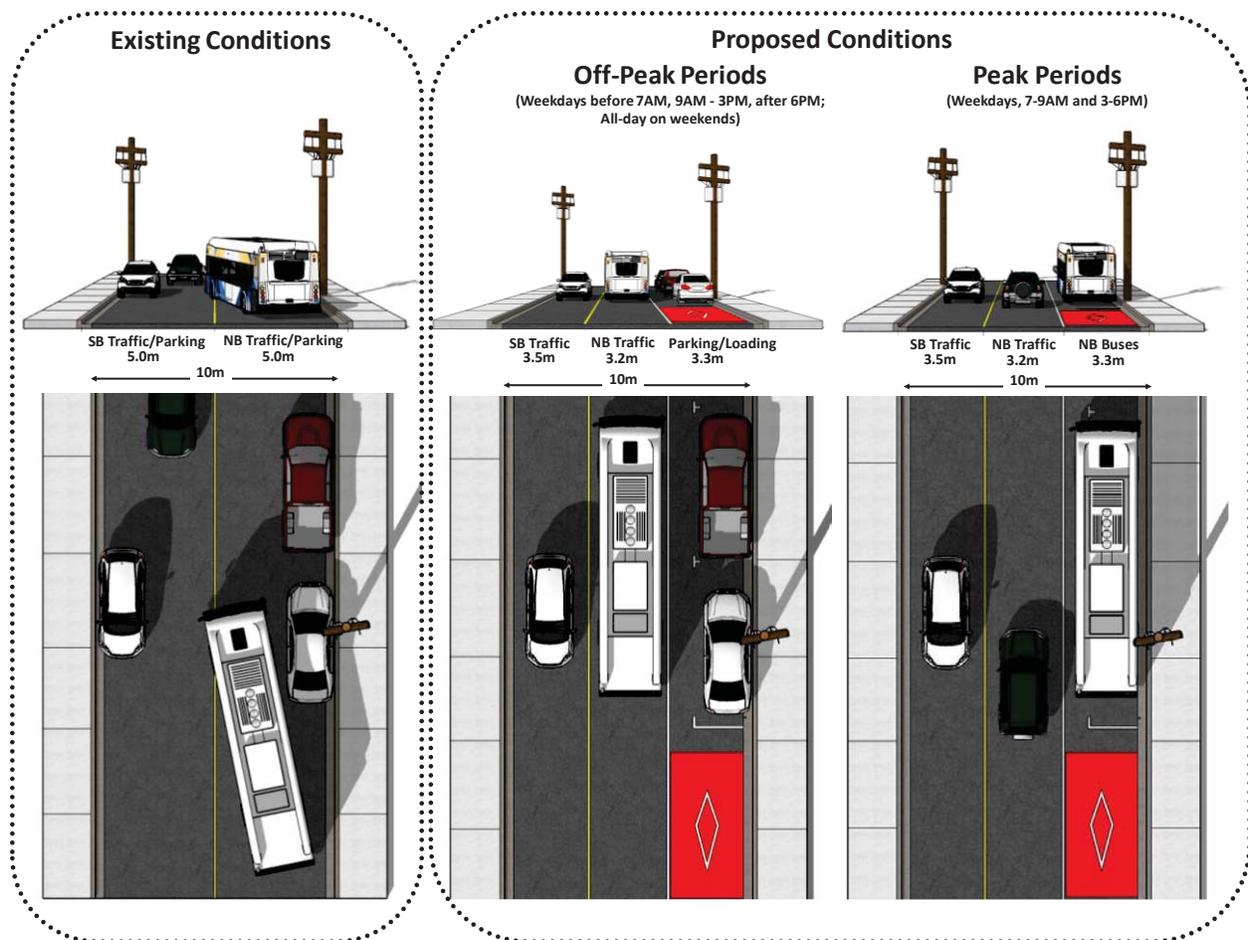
Existing and proposed typical cross section (looking to the north) - Gottingen Street
